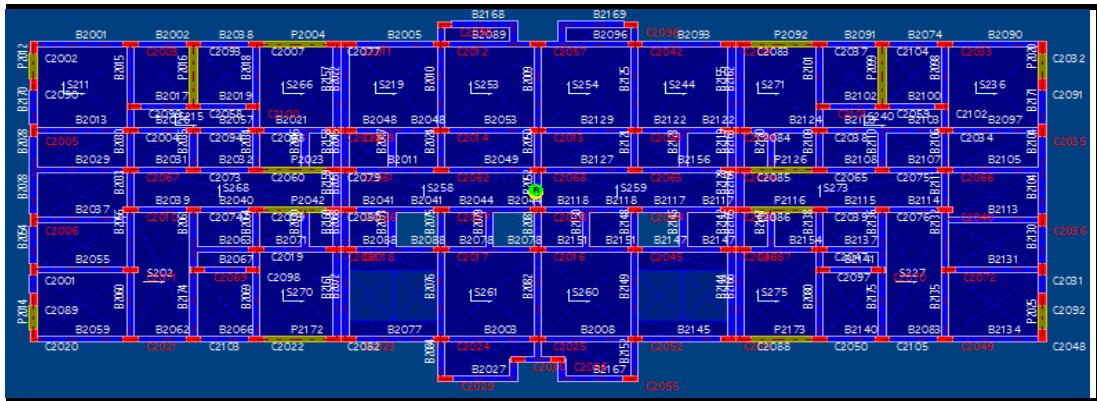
Plan of a Building with Fifteen Stories and Stiffened Coupled Shear Wall
